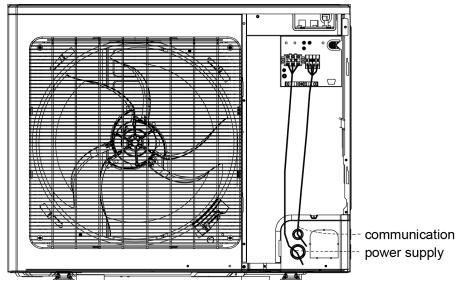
Engineering Wiring View of GMV-24WL/C-T(U), GMV-28WL/C-T(U)
